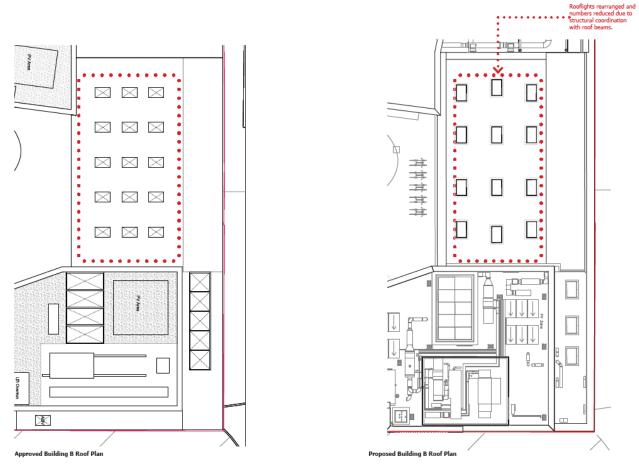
Block B approved roof plan along with Block B proposed roof plan showing rearranged rooflights.
